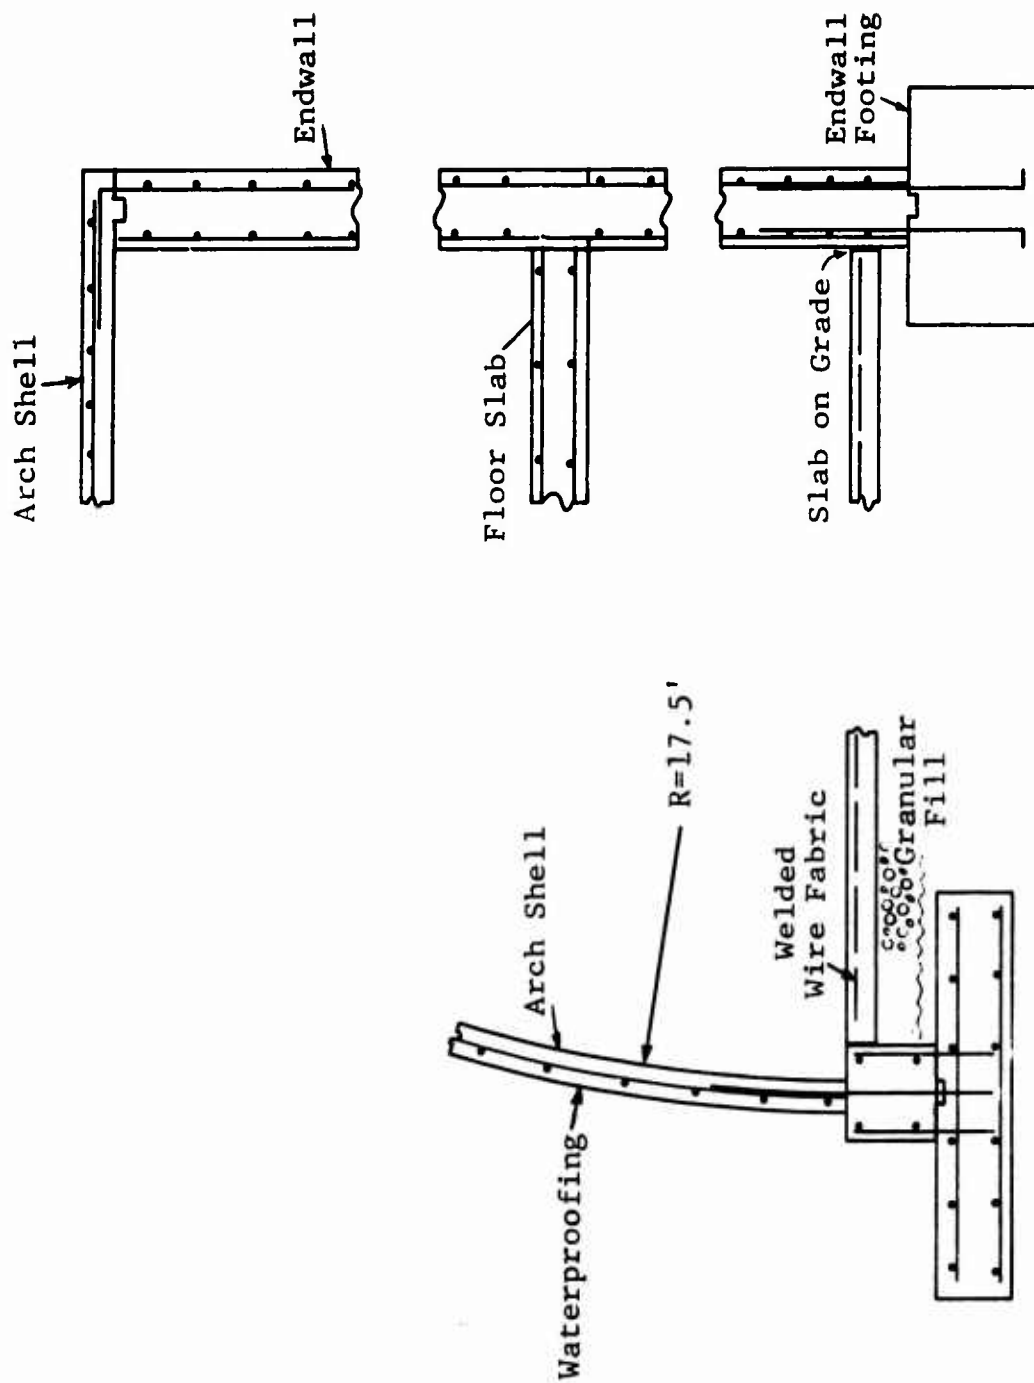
CONSTRUCTION DETAILS OF R/C ARCH
